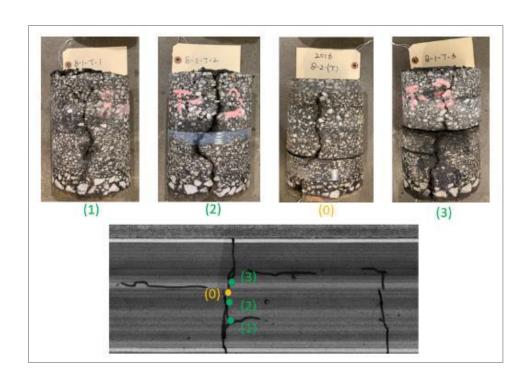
Photo. Transverse Crack, Sealed, Site 8
